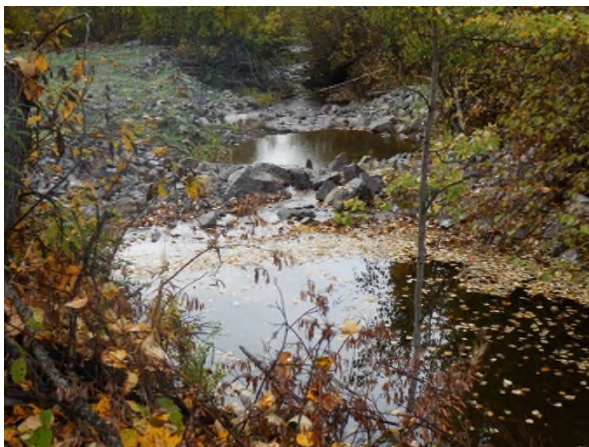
Johnny David Creek at Highway 16 – Downstream view of riffles 2 and 3 after construction (30 September 2017).
